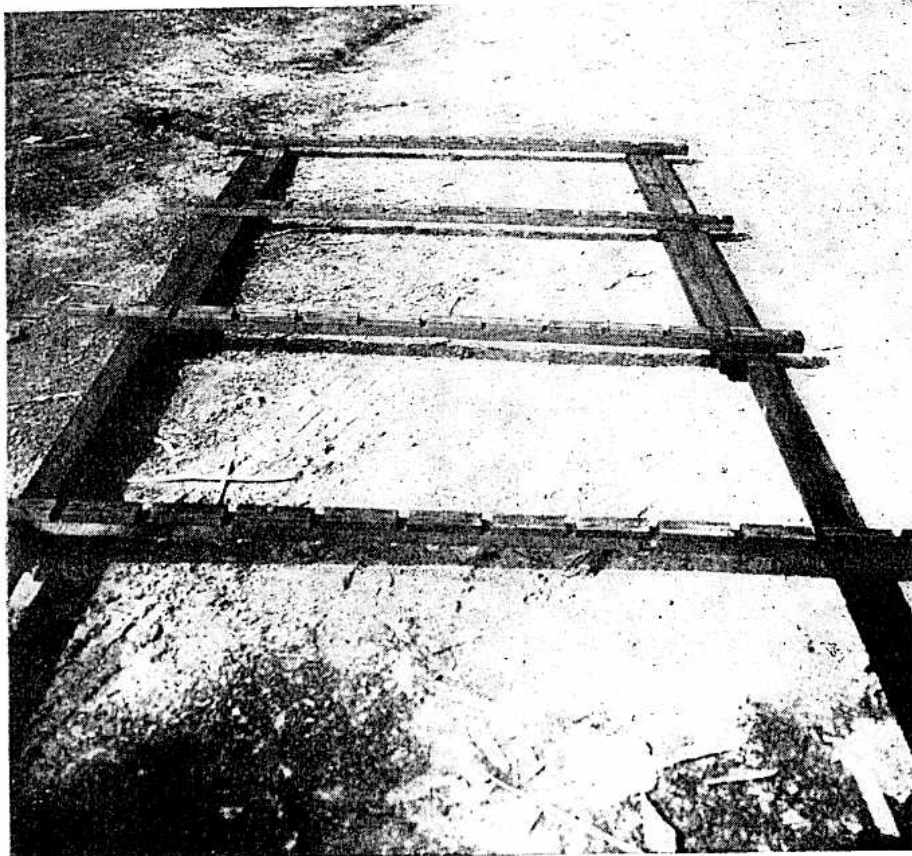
Wood frame for $\frac{3}{4}$ -in. copper tube spaced 4 in. on centers.
